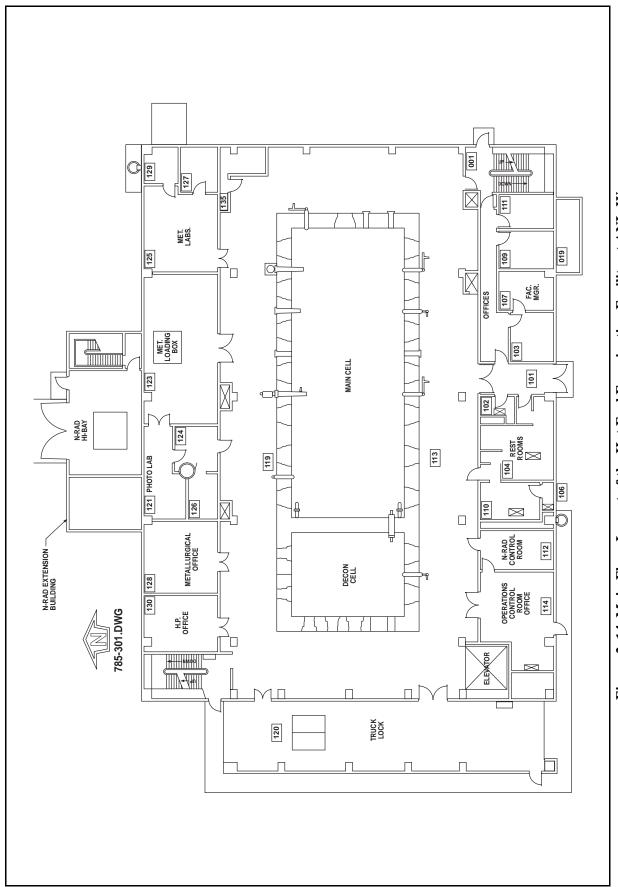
Main Floor Layout of the Hot Fuel Examination Facility at ANL-W
